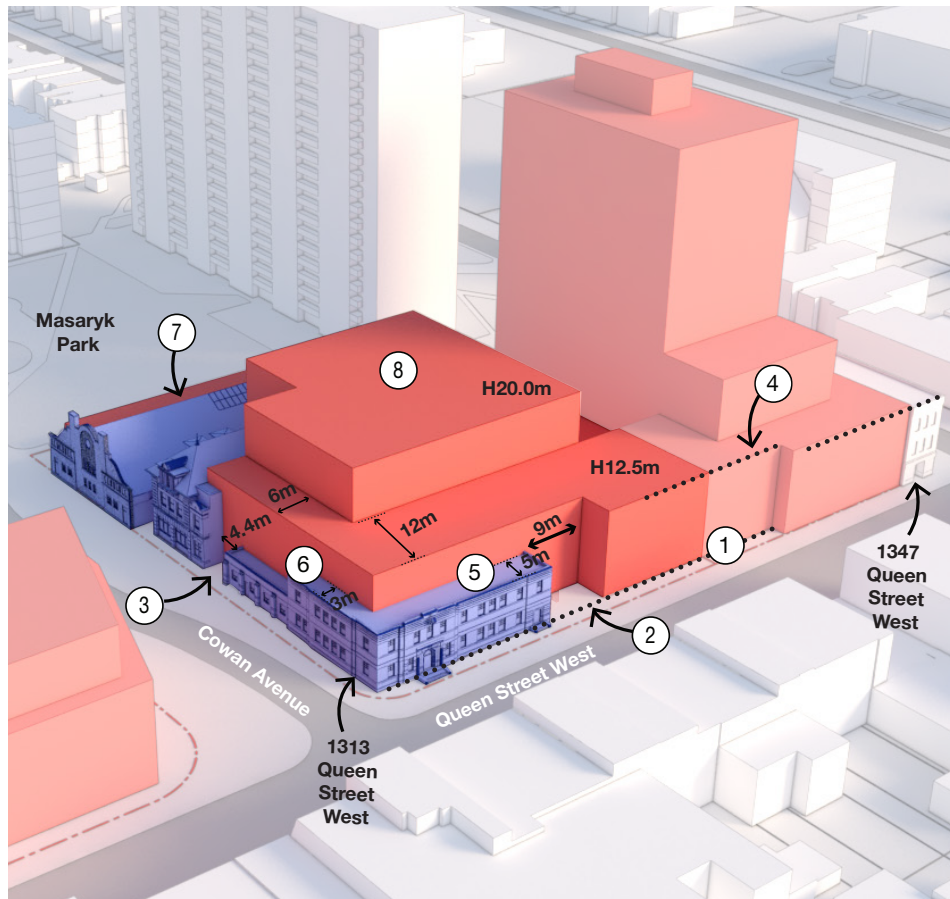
/ Centre Block massing model: front view (view looking southwest from Queen Street West).
